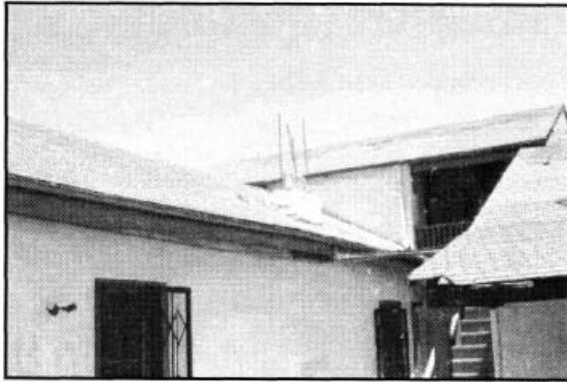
Vicente Sanchez Adobe. A collapsed chimney in the north section of the adobe. The chimney collapsed even though it had reinforcing rods which are now exposed.
